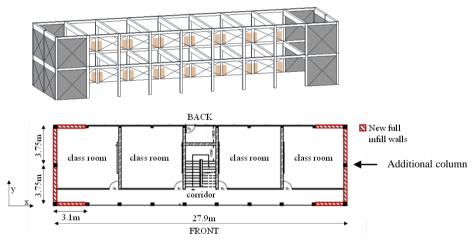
Illustration of the elevation (above) and type plan (below) of SSE School design, adapted from Del Zoppo et al. (2021)
